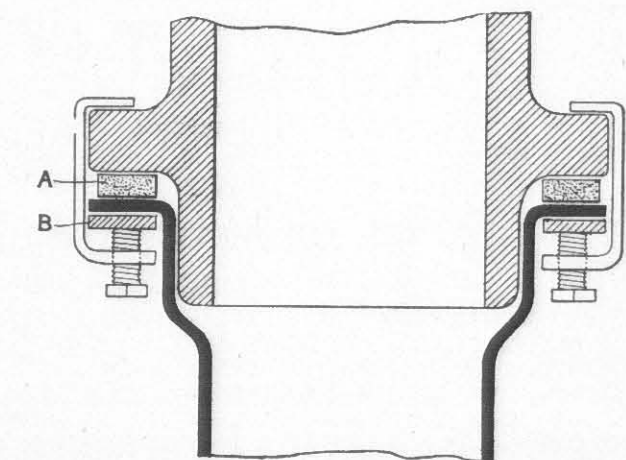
Socketed and Flanged Joint with India-rubber Ring, &c.
